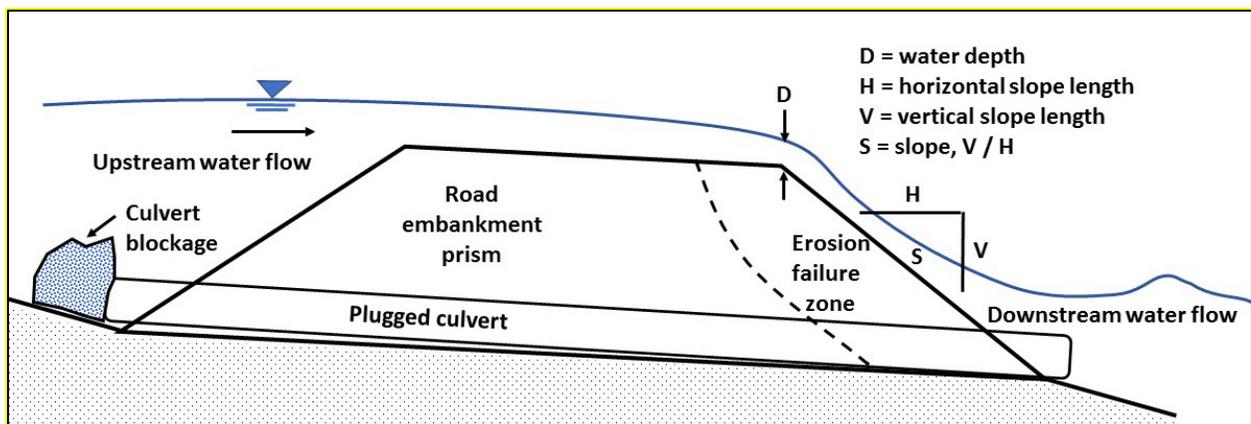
Road embankment with plugged culvert, failing due to overtopping (Provided by USFS)
